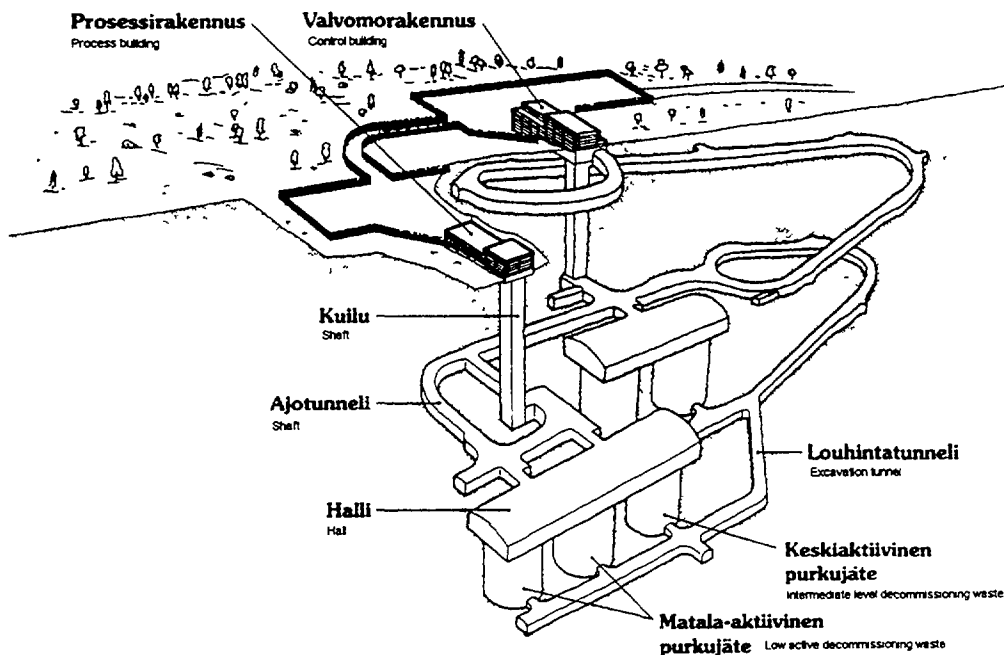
Final disposal facility of the Olkiluoto plant.
